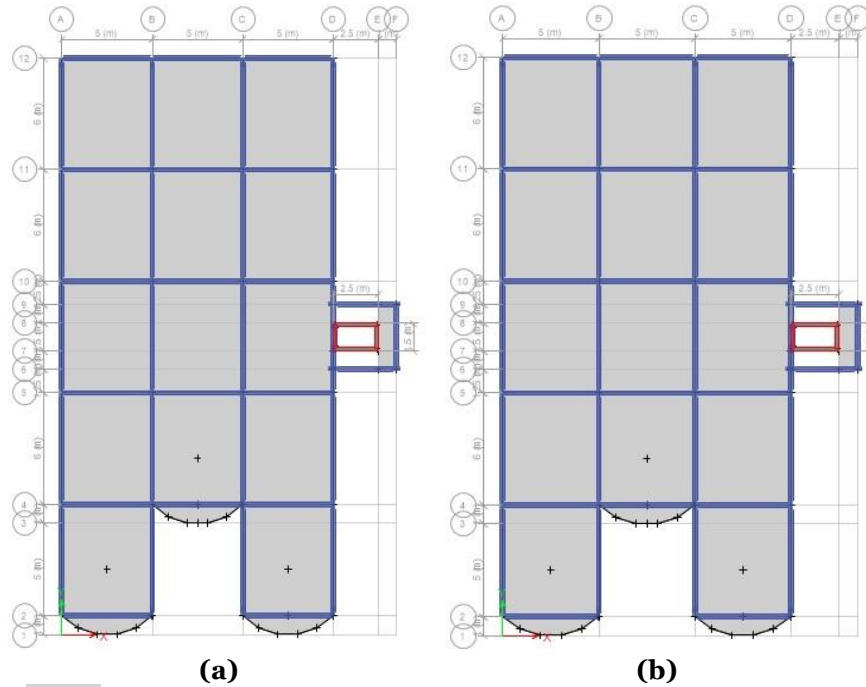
Top View of Structure (a) Concrete Structure, (b) Steel Structure.
